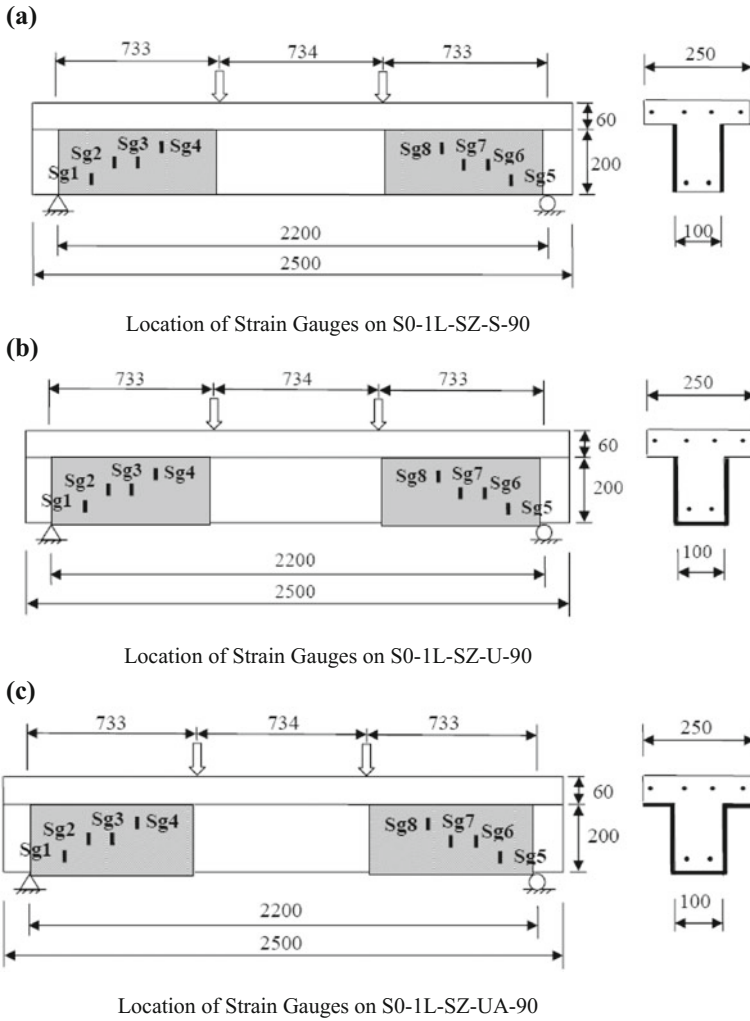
Details of surface strain gauge positions (GFRP sheet in shear zone)
